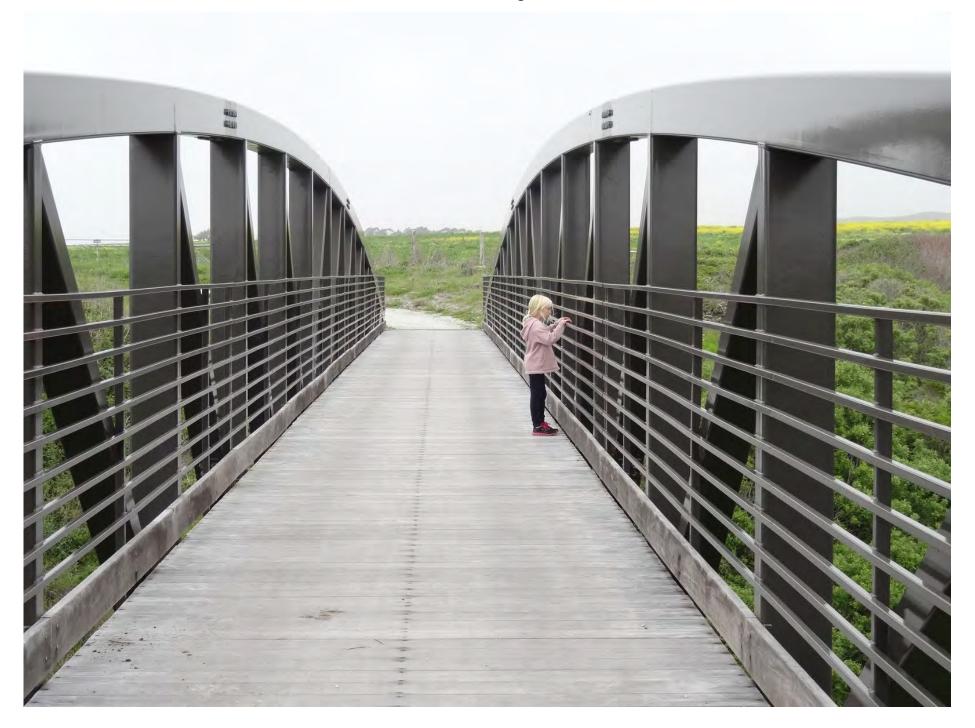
Prefabriacted Vehicle Truss Bridge at Cowell-Purisima Trail (POST)
